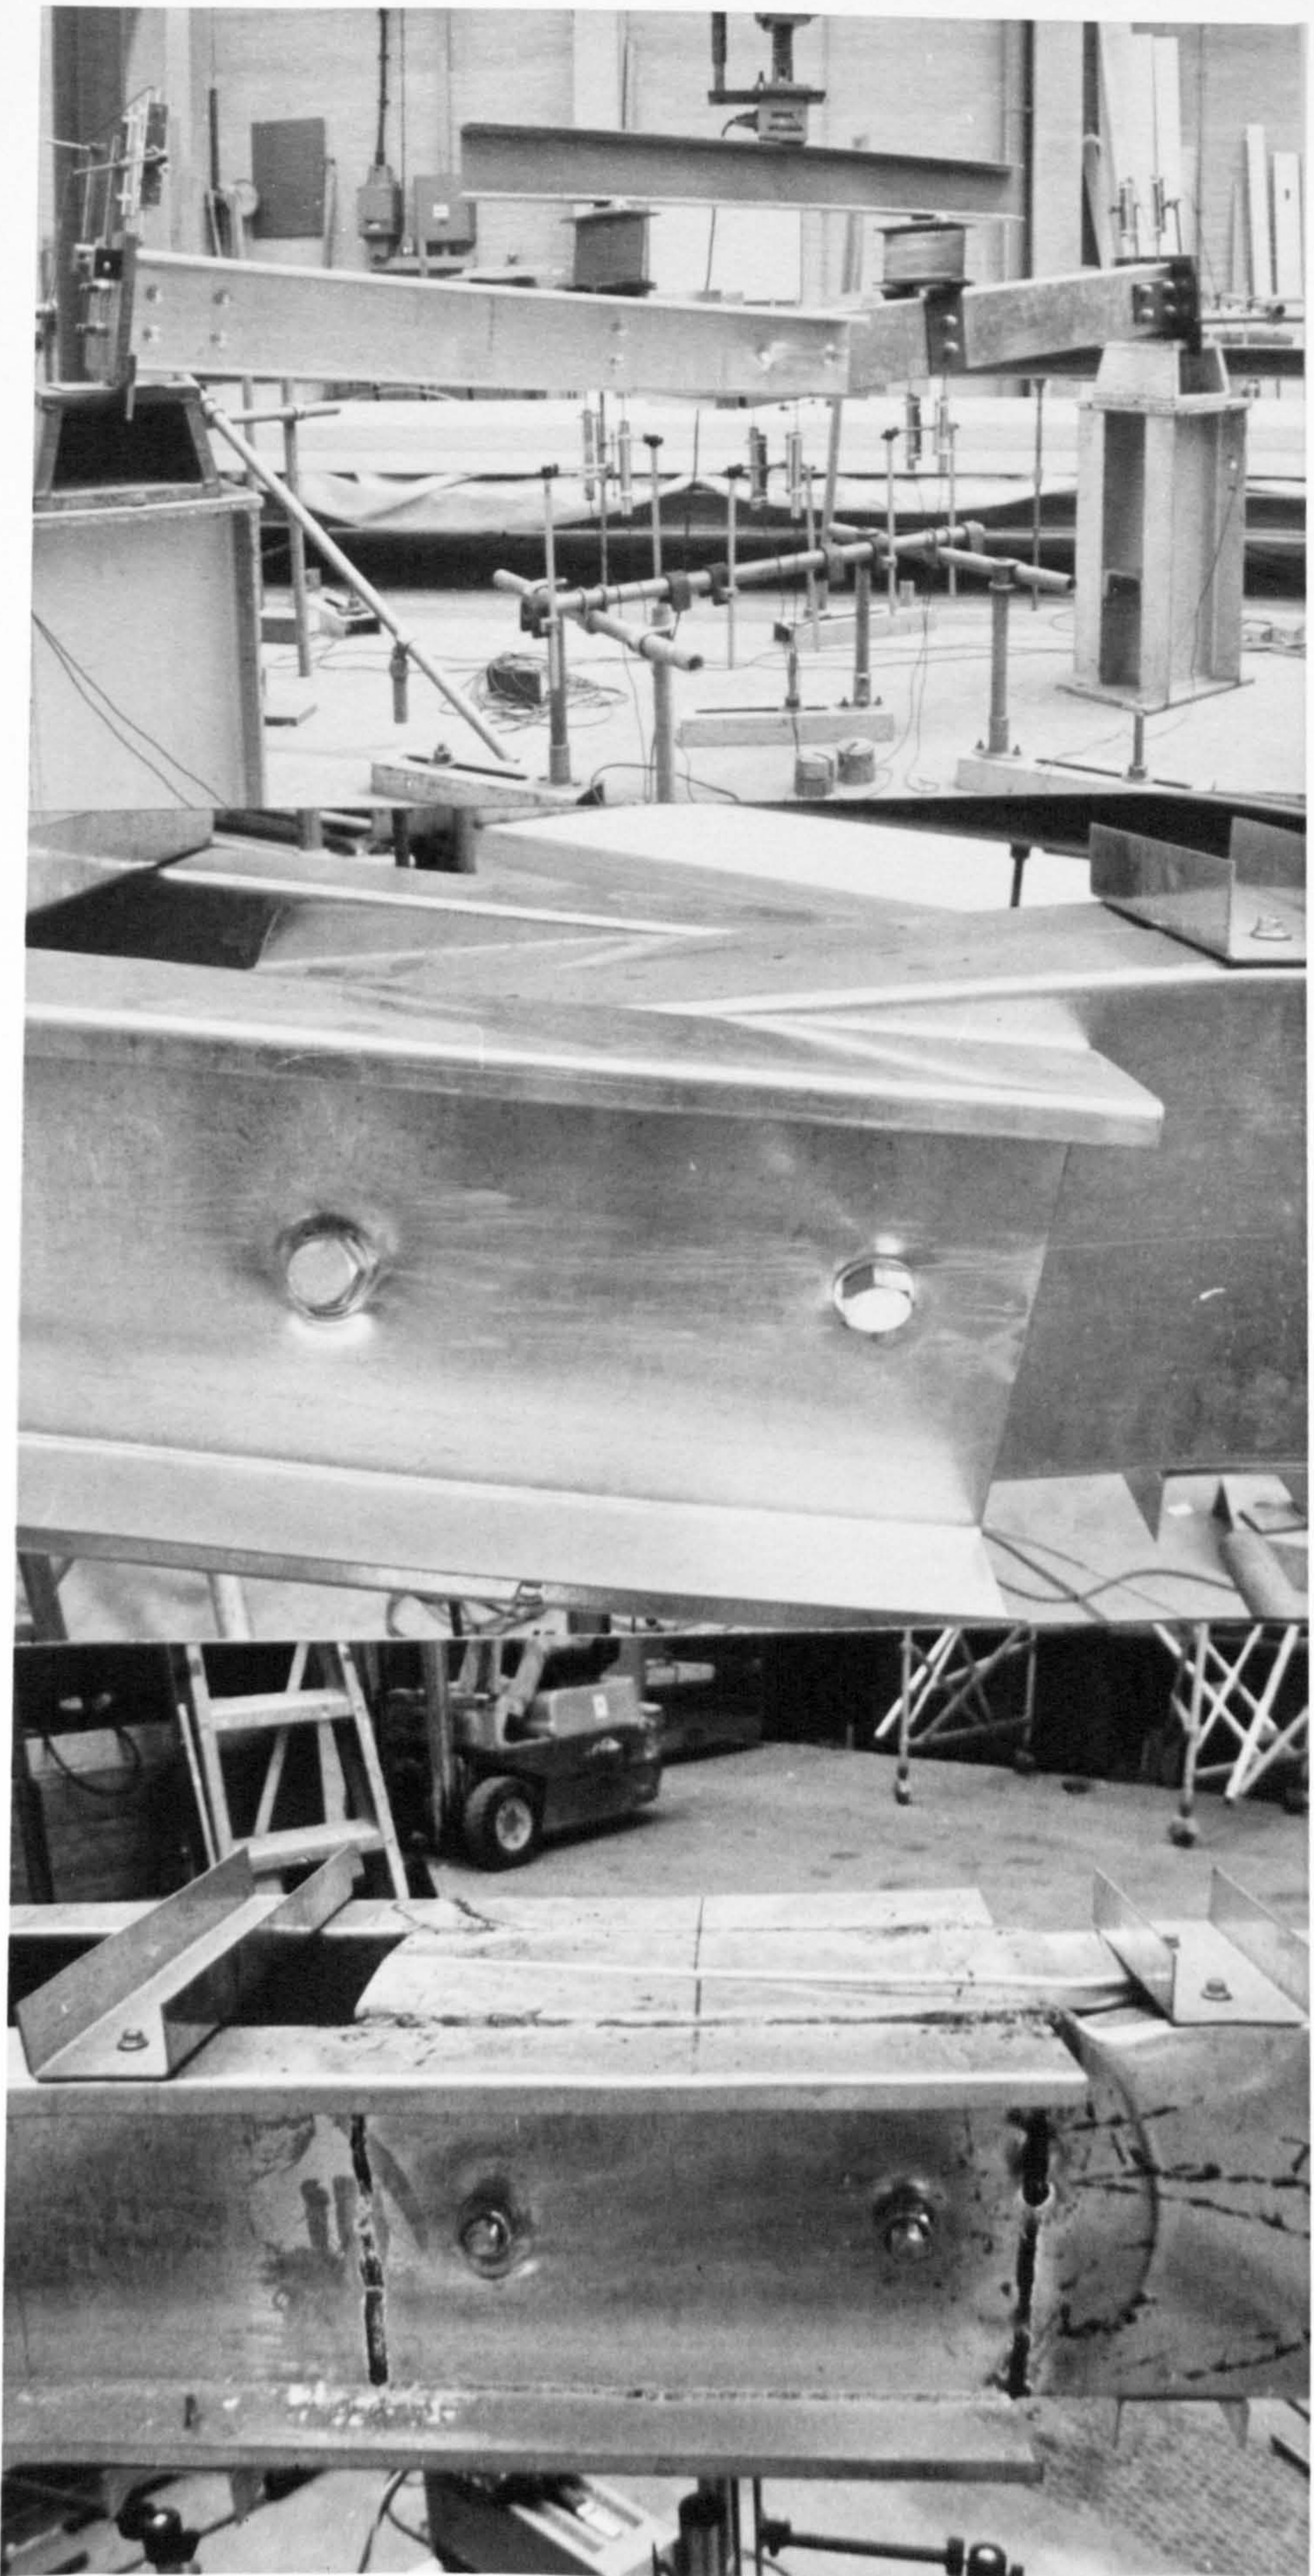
Two bolt beam connection. Bolted and welded beams at failure
